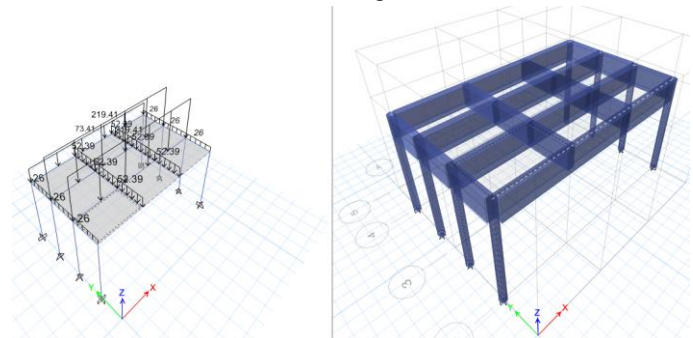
3D view of 4 longitudinal girder T beam and loading.
